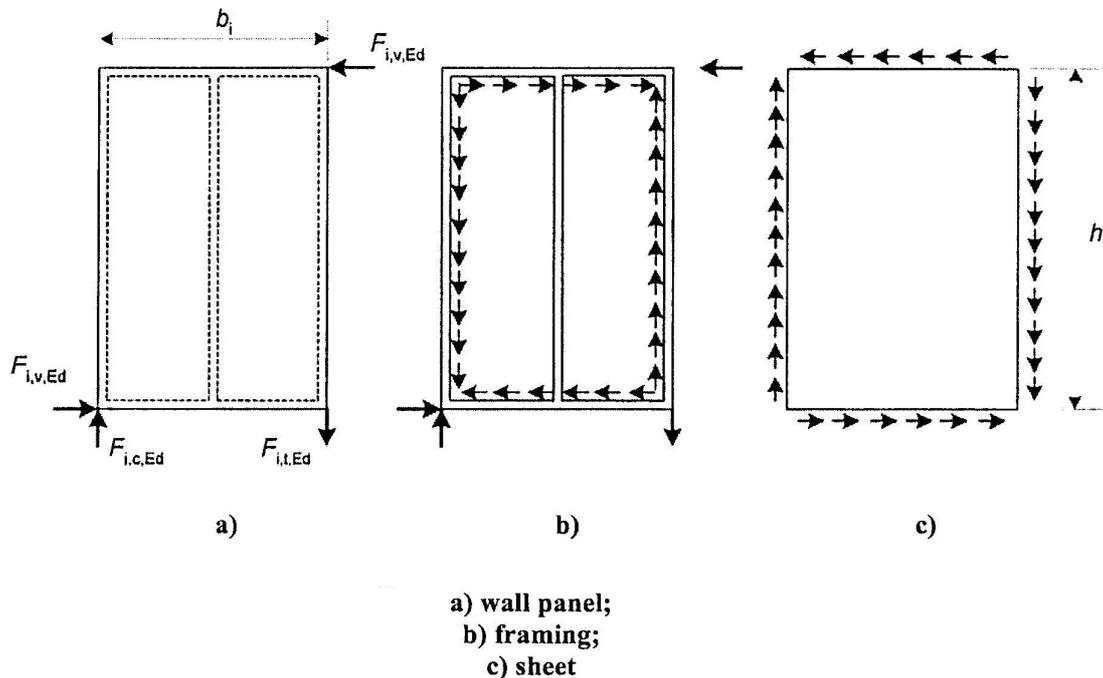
Forces acting on the wall panel, the framing and the sheet (Source: Eurocode 5 prEN 1995-1-1).
